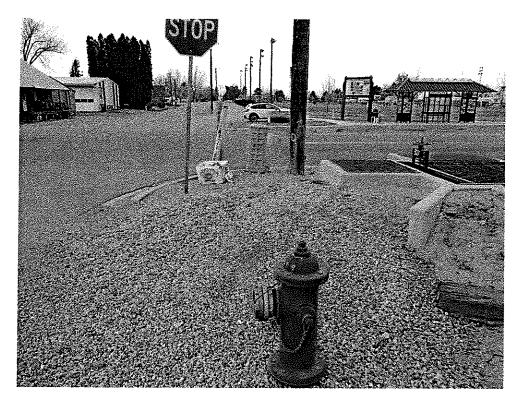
Looking North from Southeast Corner of SH-19 & Friends Road Intersection
